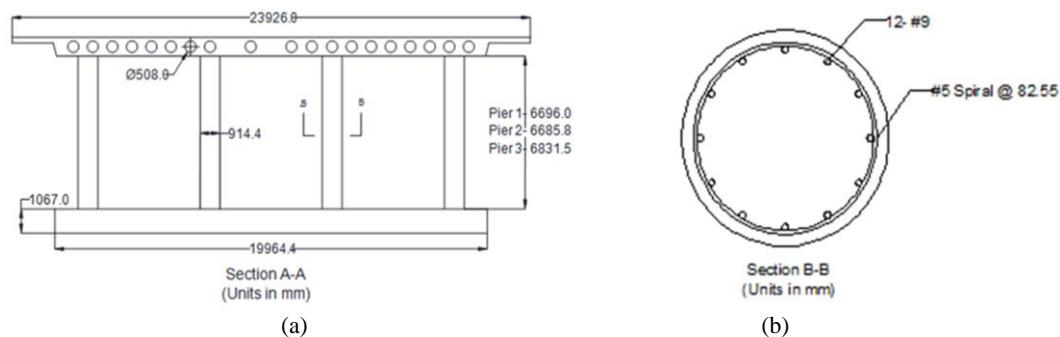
(a) Cross Section of Blair Road Bridge Super Structure; (b) Cross Section of Blair Road Bridge Column
